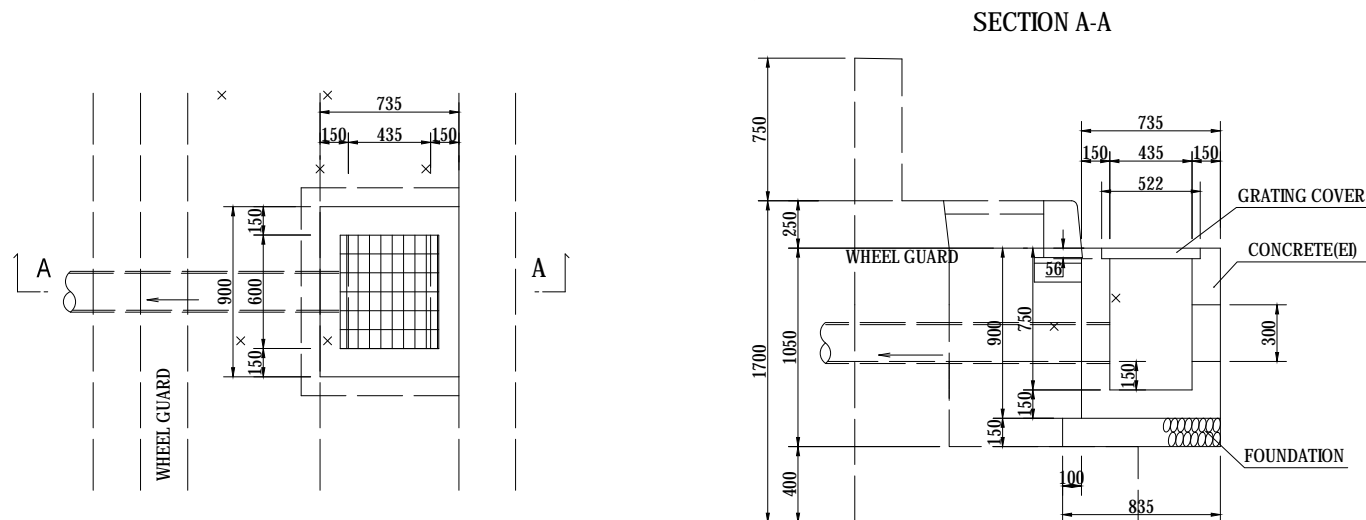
## DETAIL OF CATCH PIT (C-DITCH) TYPE A S=1:40
